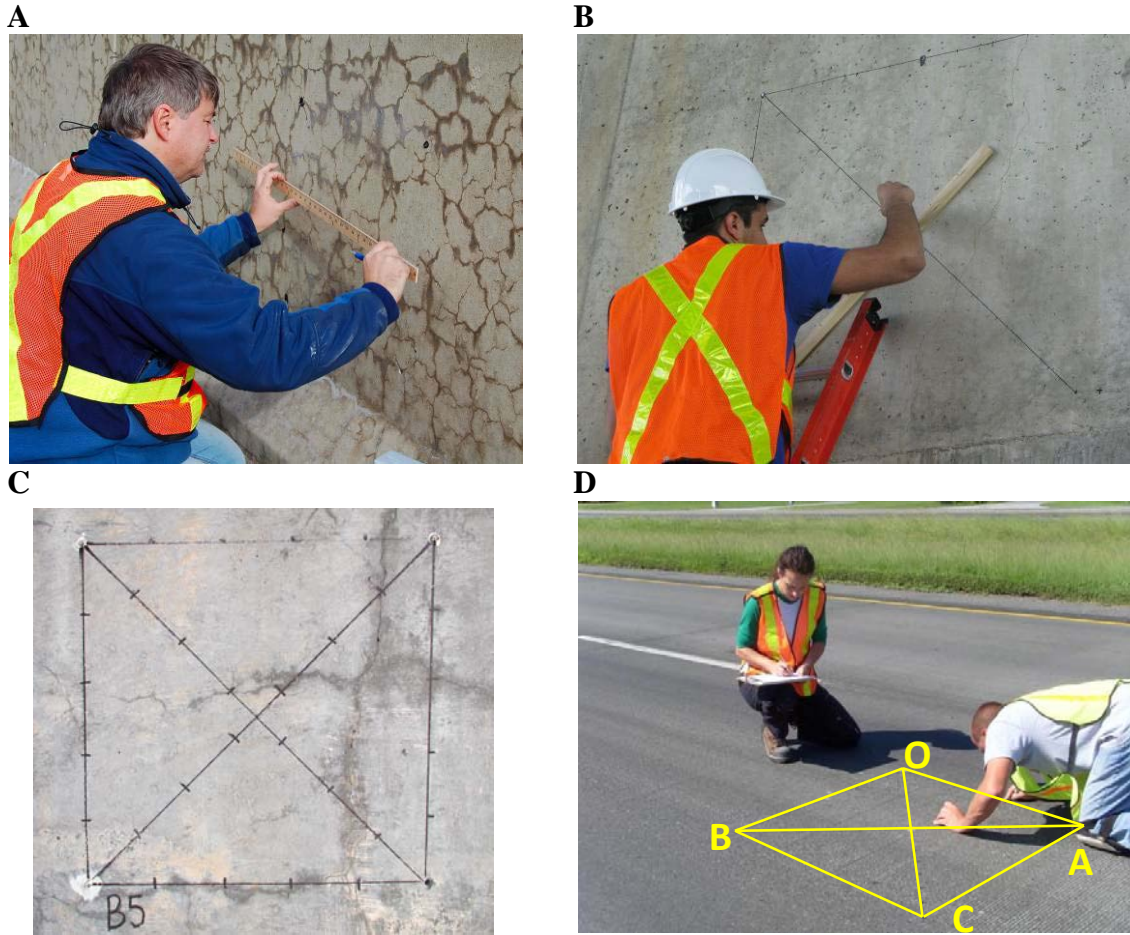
Example of crack mapping grid. A&B: Drawing of the grid. C: 500-mm by 500-mm (20-in. by 20-in.) square drawn on an abutment wall. D: Crack map over a concrete pavement section affected by ASR.
